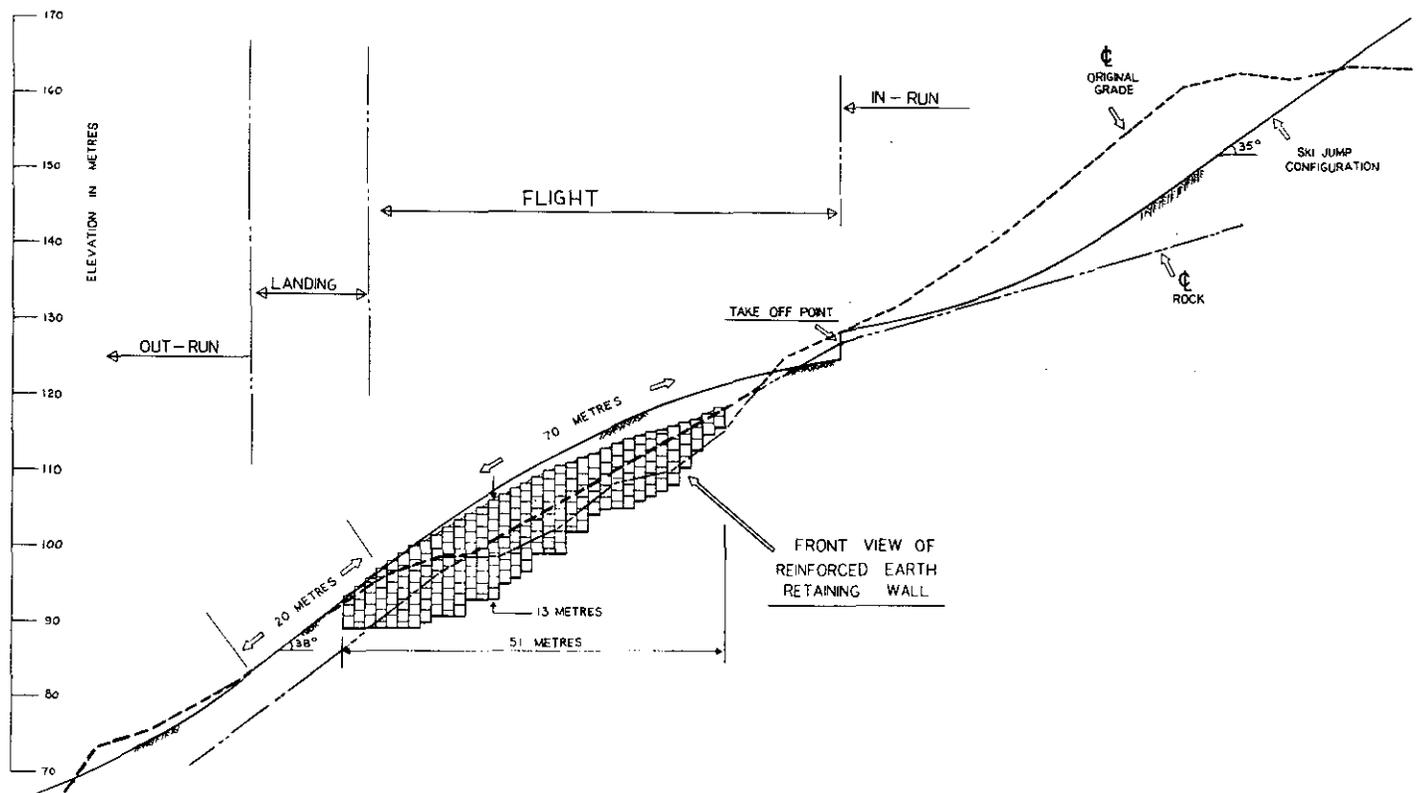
Longitudinal profile (Section B-B) showing front view of the reinforced earth structure relative to the ski jump.
